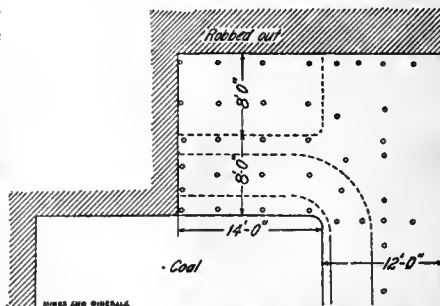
COAL EXTRACTED, PLACE READY TO MAKE LAST FALL IN 42-FOOT CENTER ROOMS
